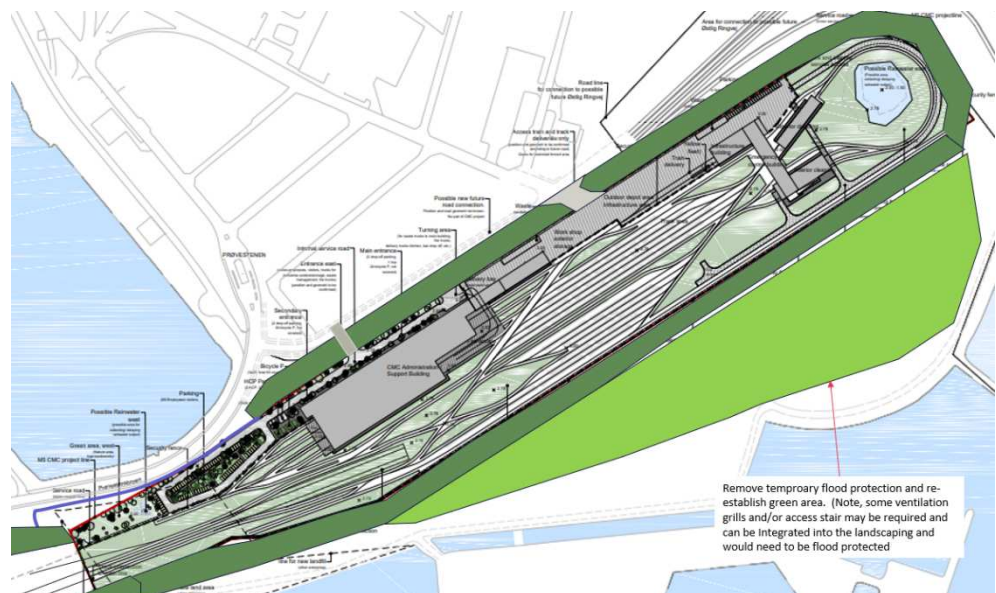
Phase 13 - Øresund metro Ramp Construction Sequence.
